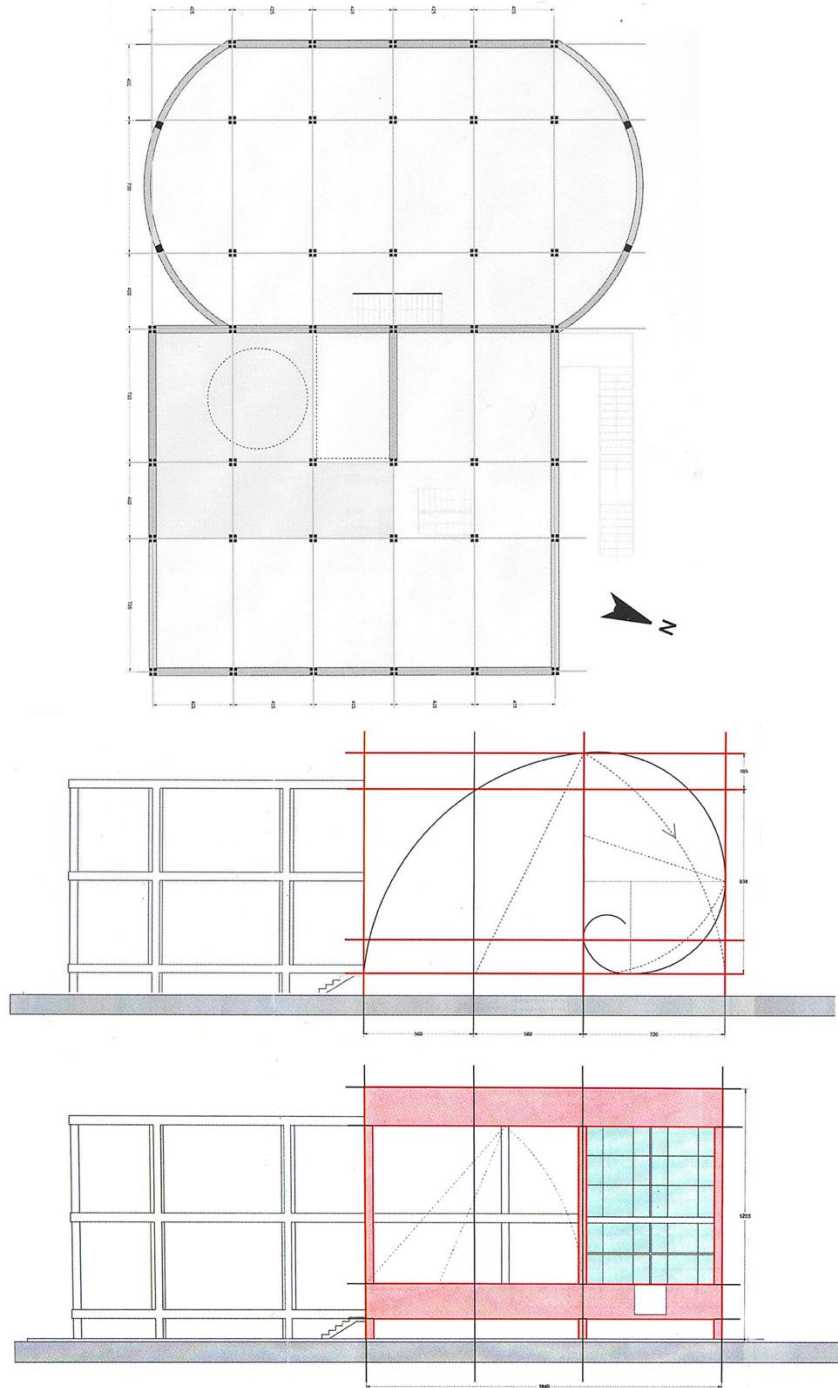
Structural grid and proportions of south elevation (R. Bellinazzi, 2018)
